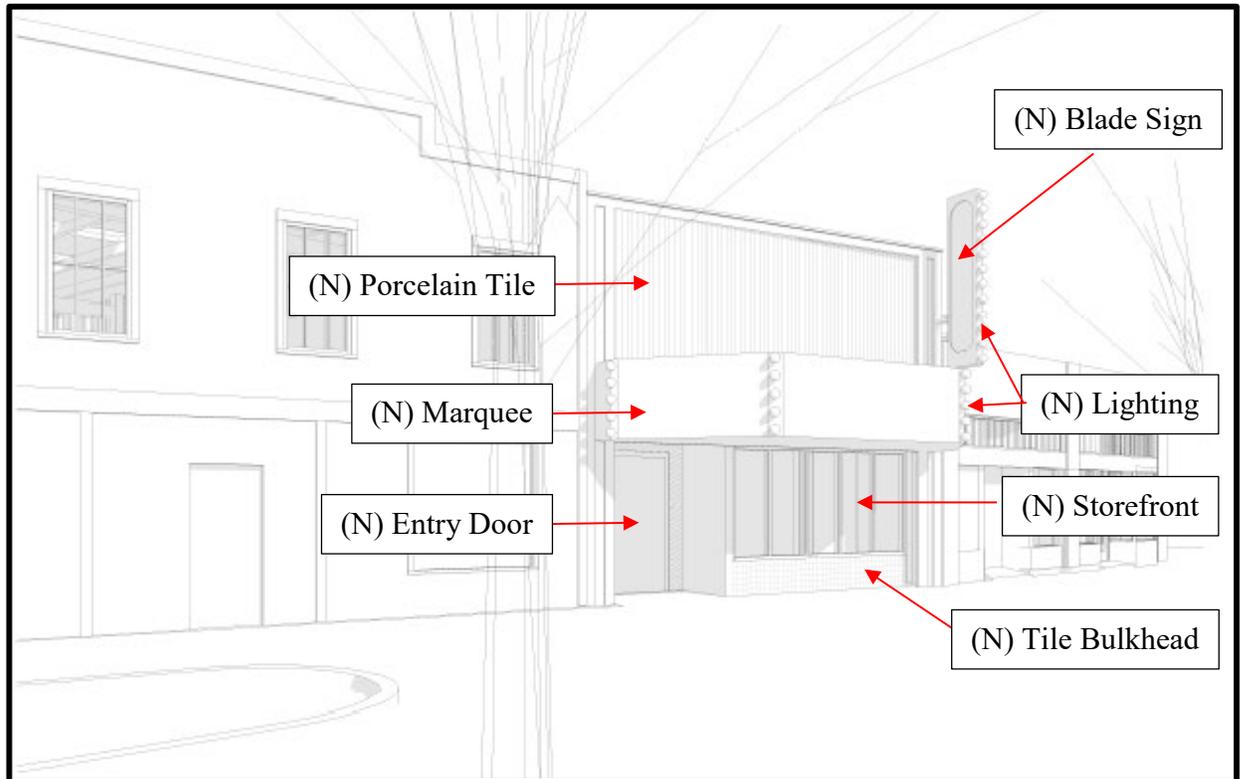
Proposed East Elevation, Sheet A02, Attachment 1- Project Plans
